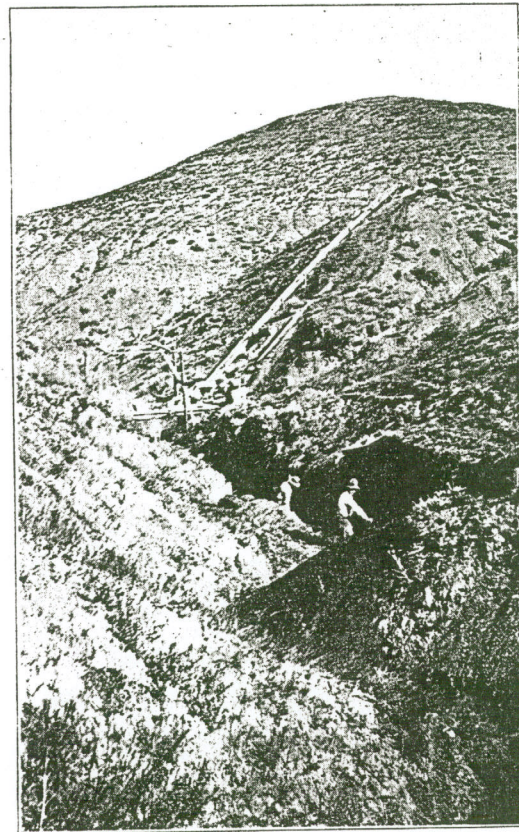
Excavating for Pipe Culvert, Lewistown-Great Falls Line.
